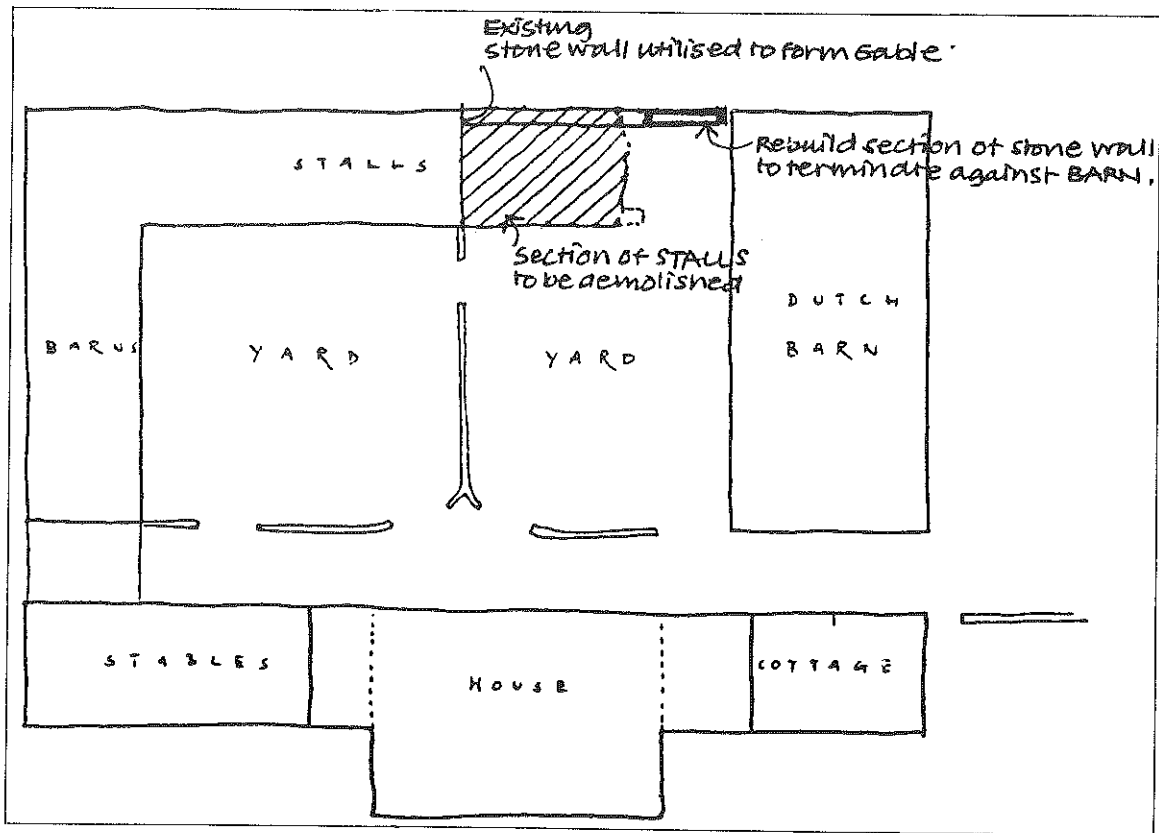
WARREN FARM. Sketch plan of farmstead in 1984. Except for Dutch barn, all buildings shown were built by Frederick Knight, though stables have been converted to loose boxes. (supplied by Mr. R. Croft, Planning Dept., Somerset C.C.)
